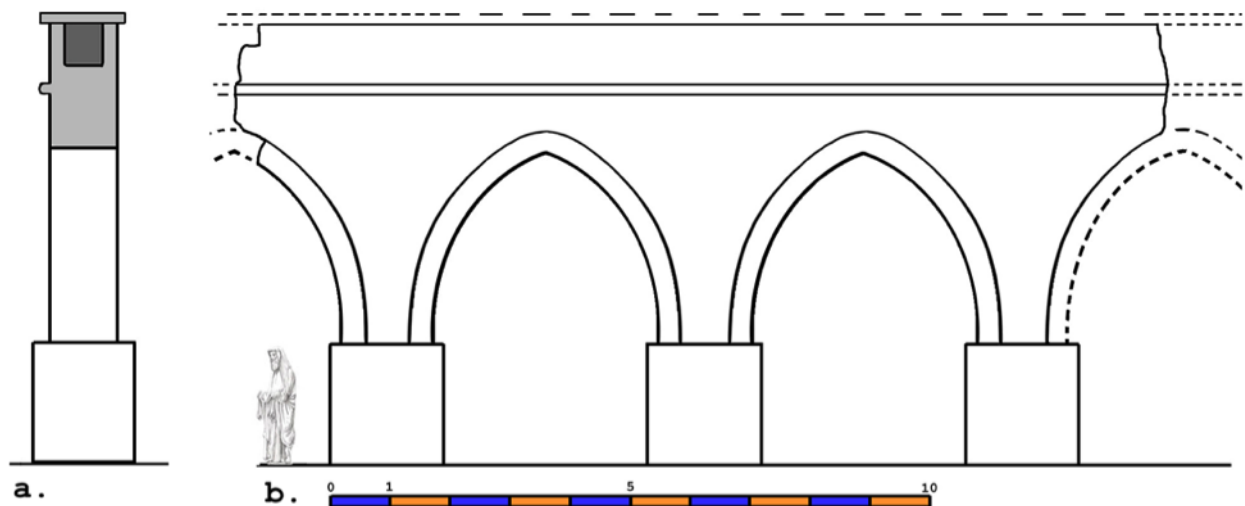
Elevation of the Chytroi-Salamis-Constantia Aqueduct: a. cross section; b. elevation.
